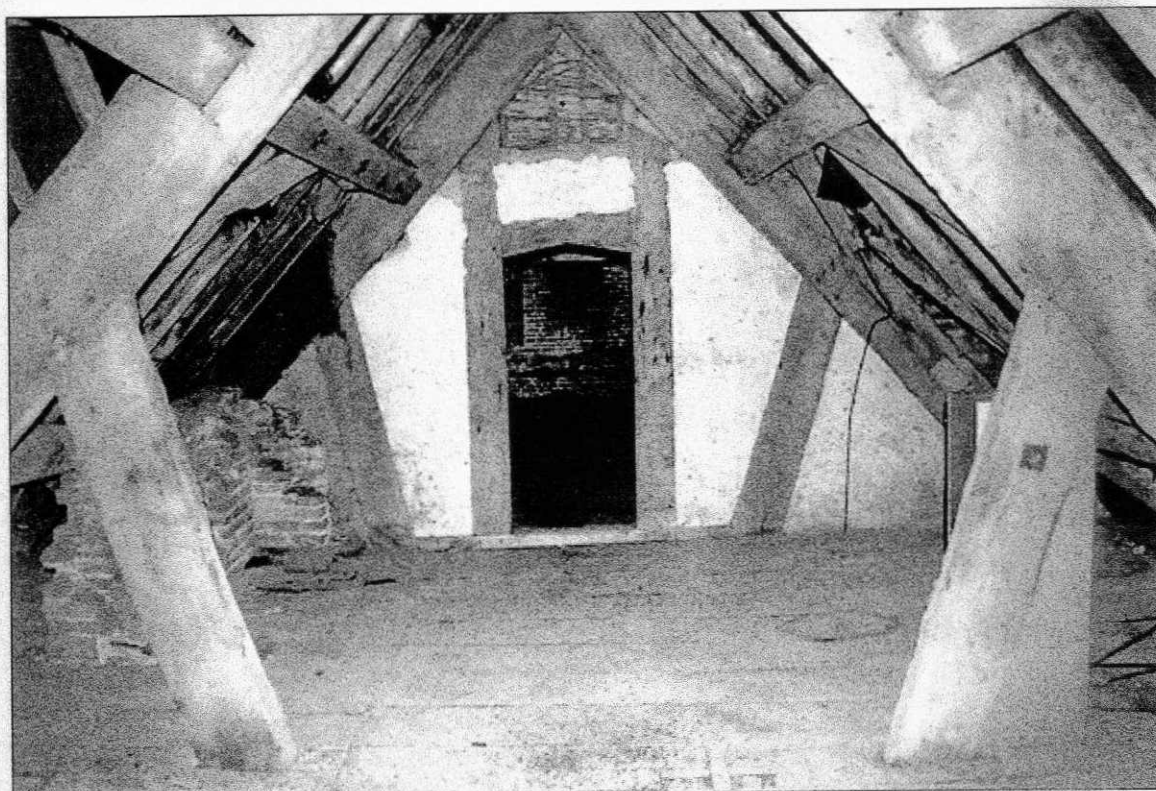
(above): Western gable of attic showing remains of roof truss within later brickwork
